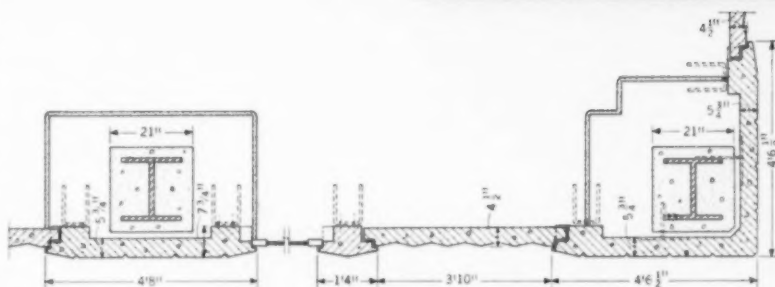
Building walls consist of standardized precast perlite-concrete panels  $4\frac{1}{2}$  in. thick, faced with chrome stainless steel. Details of four main types of panels are shown in cross section (which corresponds with building in photo above, proceeding to left from corner). Every floor required 252 panels weighing from 1,000 to 6,000 lb each, and attached to steel frame with bolts and brackets.
